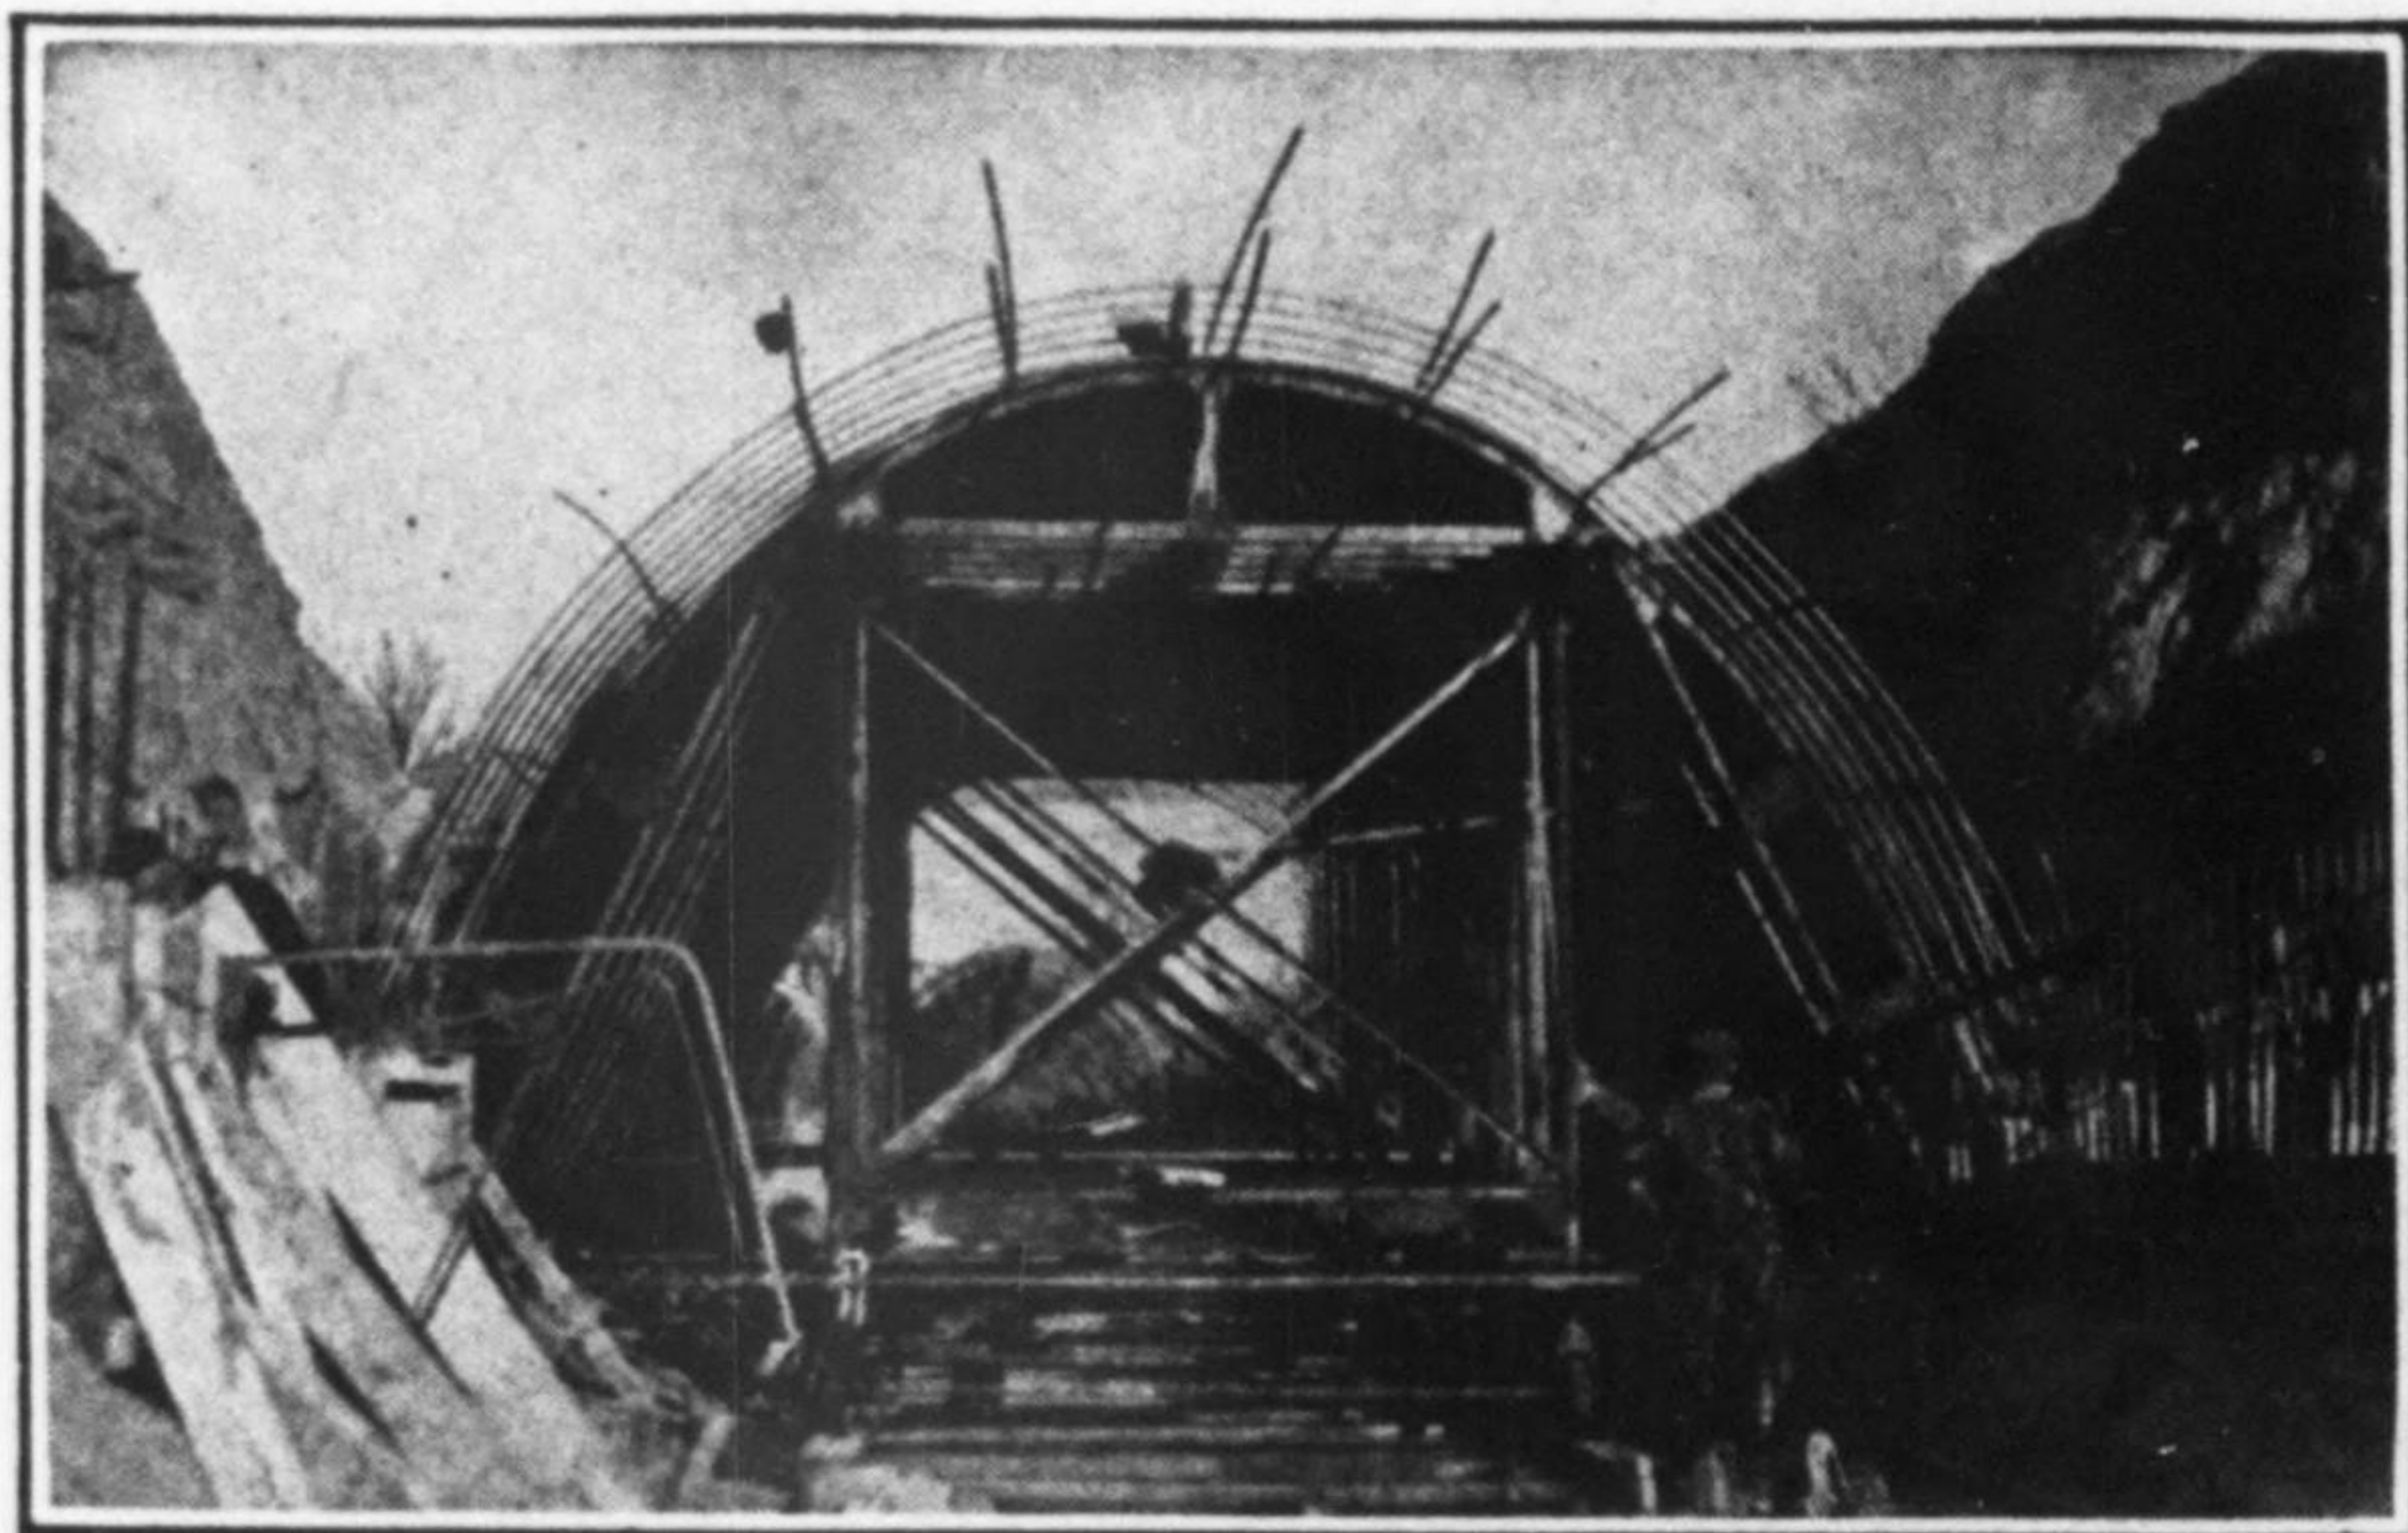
ARCH STEEL FOR GOOSENECK SEWER WITH INSIDE STEEL FORM IN PLACE
